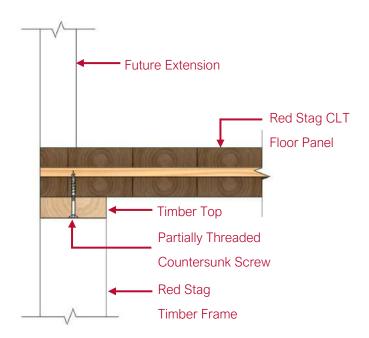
Timber frame wall to Red Stag CLT floor panel connection.
